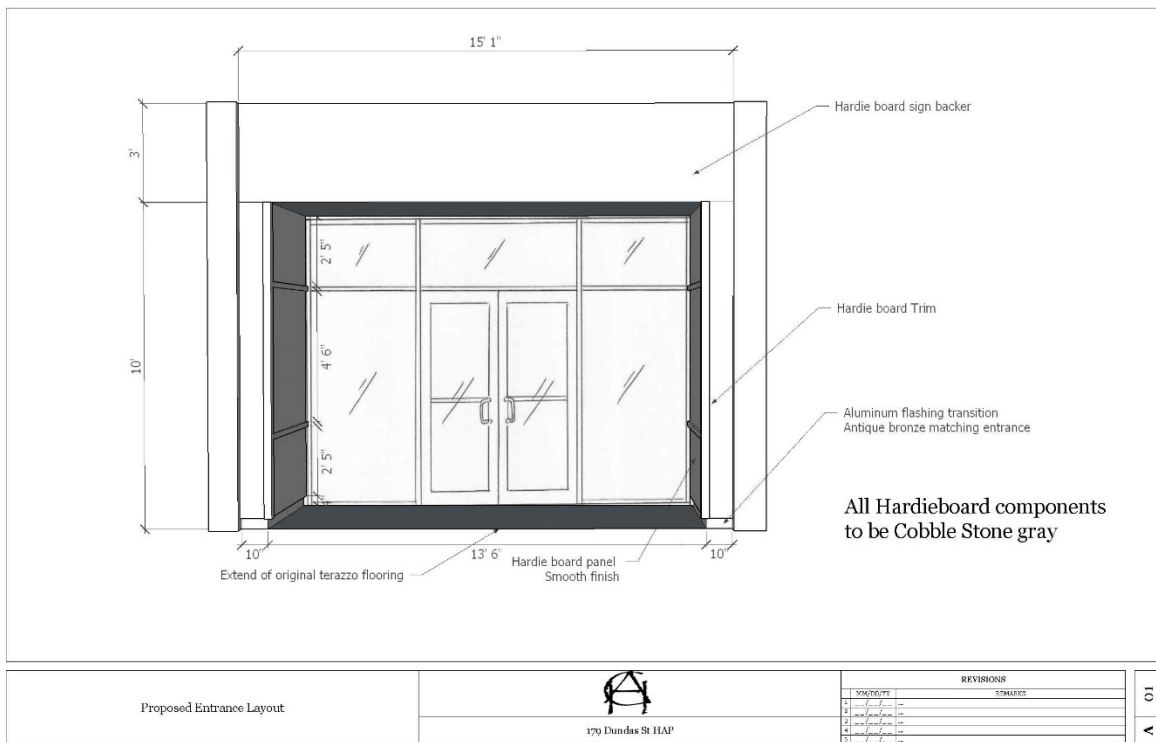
Drawing showing the proposed exterior re-cladding of the storefront at 179 Dundas Street in the Downtown Heritage Conservation District.
